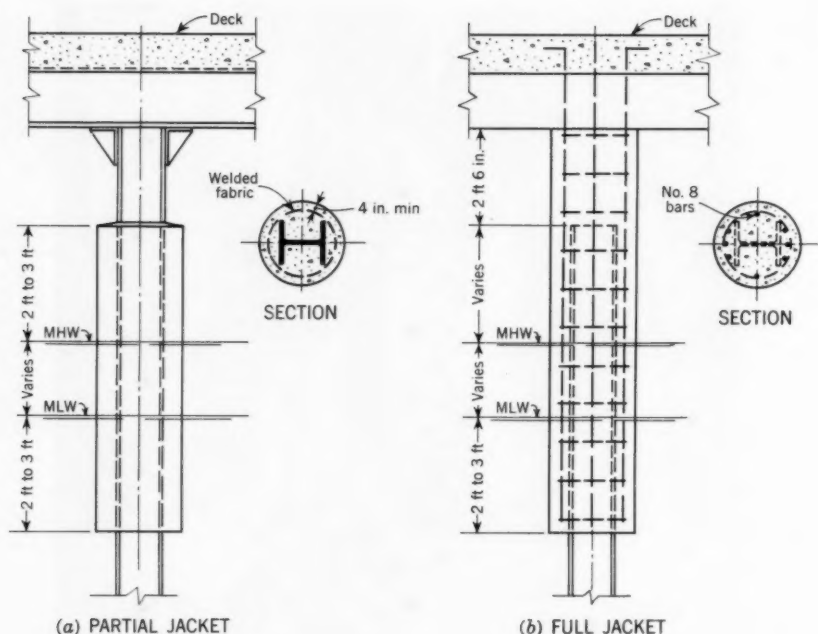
CONCRETE JACKETS FOR STEEL H PILES
